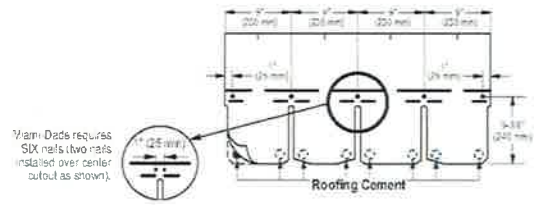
A: Use FIVE nails and eight spots of asphalt roofing cement under each tab corner.
